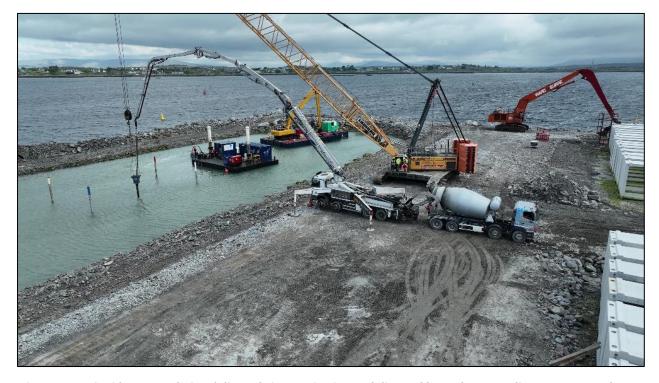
Liquid concrete being delivered via Tremie Pipe and directed by underwater divers to surround and hold the foundation beams in place.
